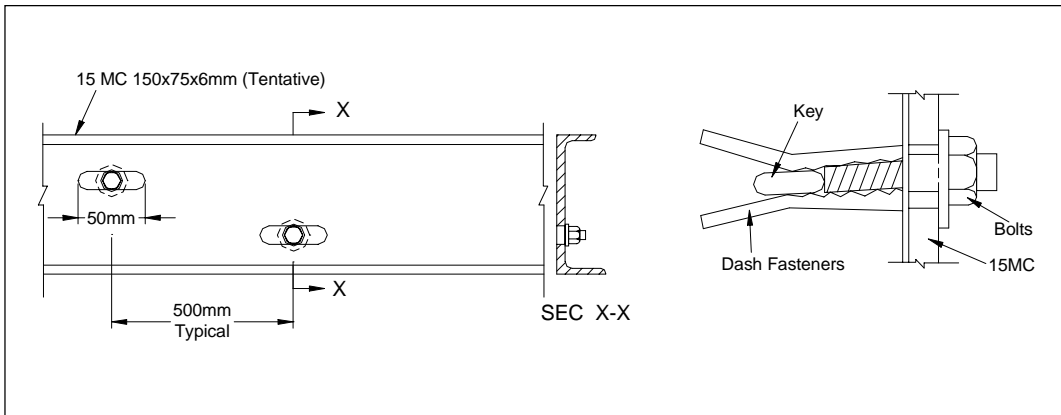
Details of fastner system and stress relieving girder
